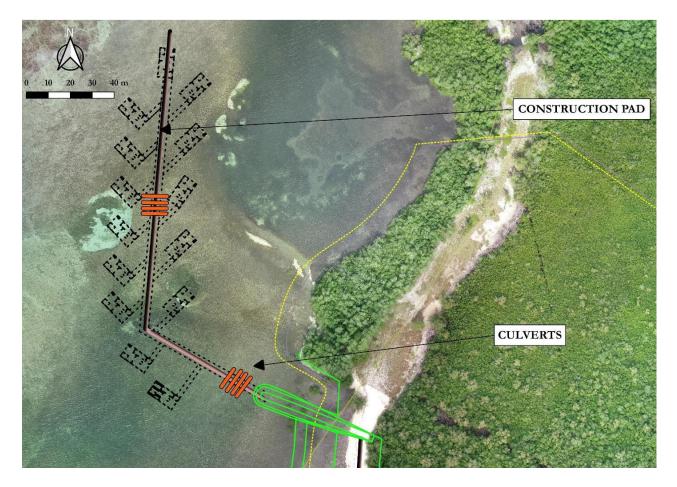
Schematic showing the layout of searoom construction pad and culverts
